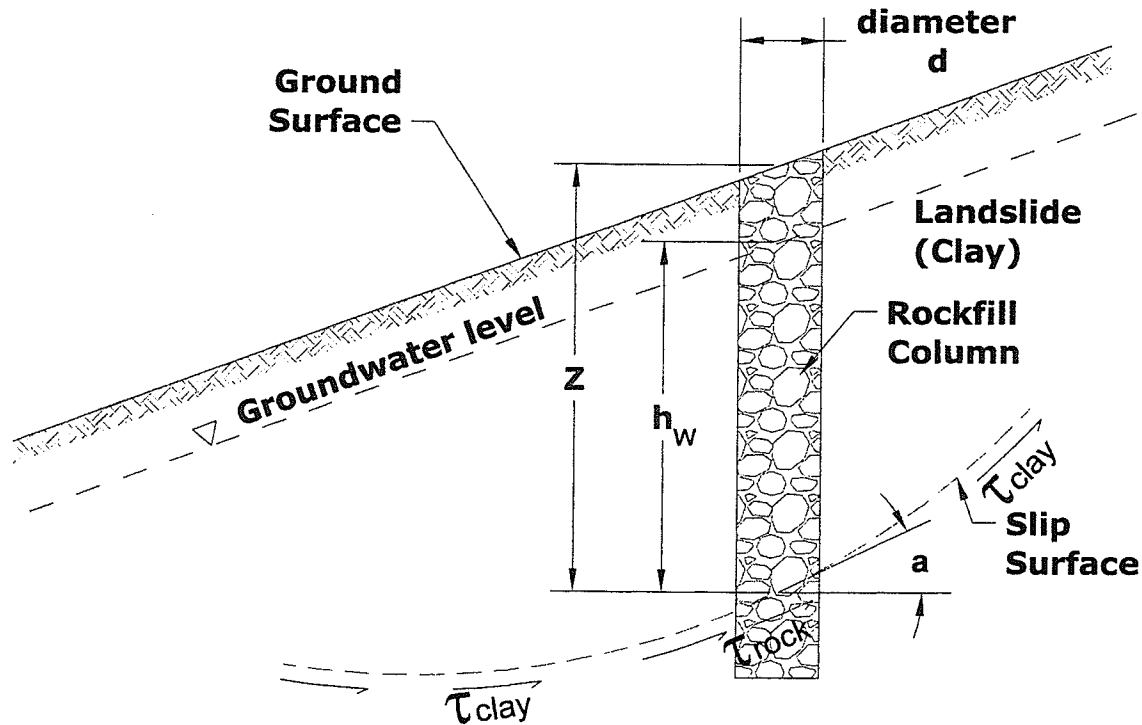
Schematic diagram showing the potential shear failure through rockfill column stabilization (after Cornforth 2005)
